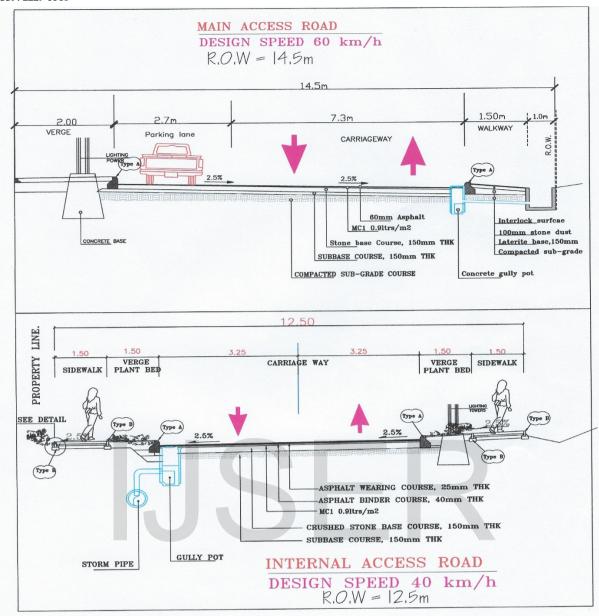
Typical road cross section- Main Access Road and Minor Access Road
